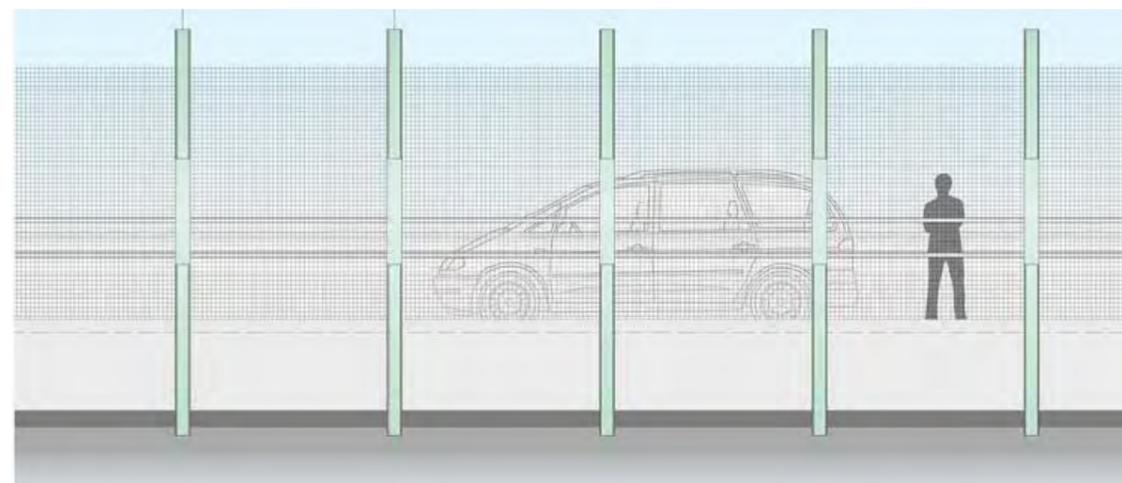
Bridge over M1 Princes Motorway - BR01 - Elevation (Scale 1:150)
